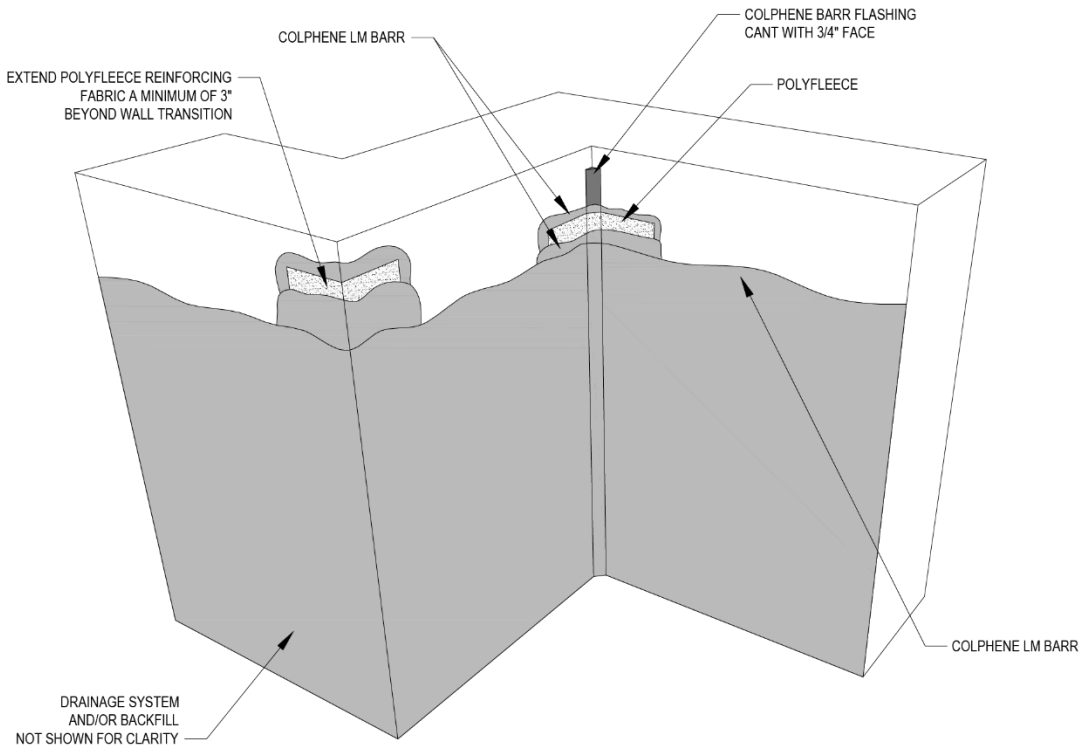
Non-Reinforced COLPHENE® LM BARR At Inside/Outside Corners
